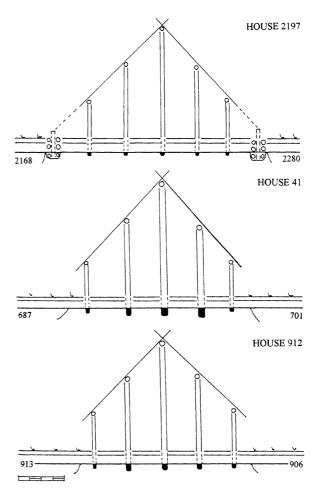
a. Idealised reconstruction of an average crosssection through the structures of houses 41, 912 and 2197. - Ideální rekonstrukce průměrného příčného řezu stavbami domů 41, 912 a 2197.
